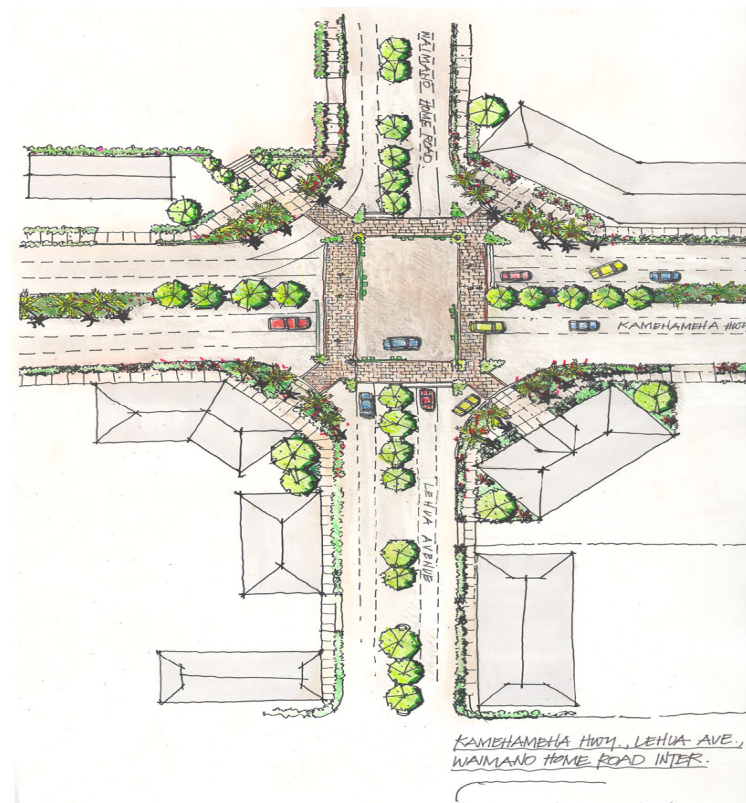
Proposed Improvements at Waimano Home Road/Lehua Avenue and Kamehameha Highway Intersection
